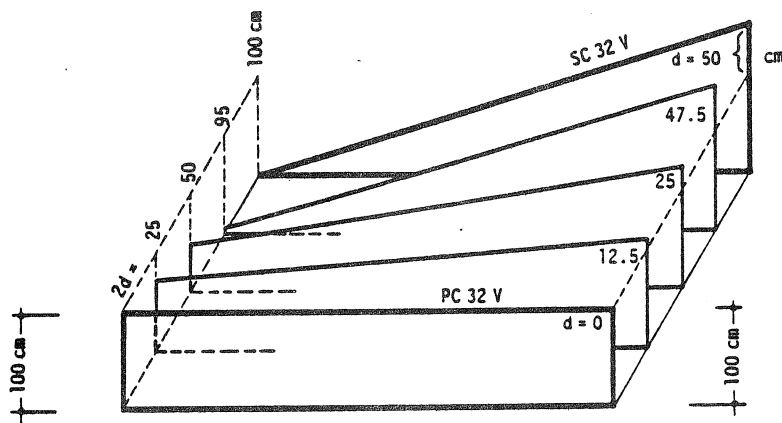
Transition from the parallel chord truss to the roof truss described by the parameter d
